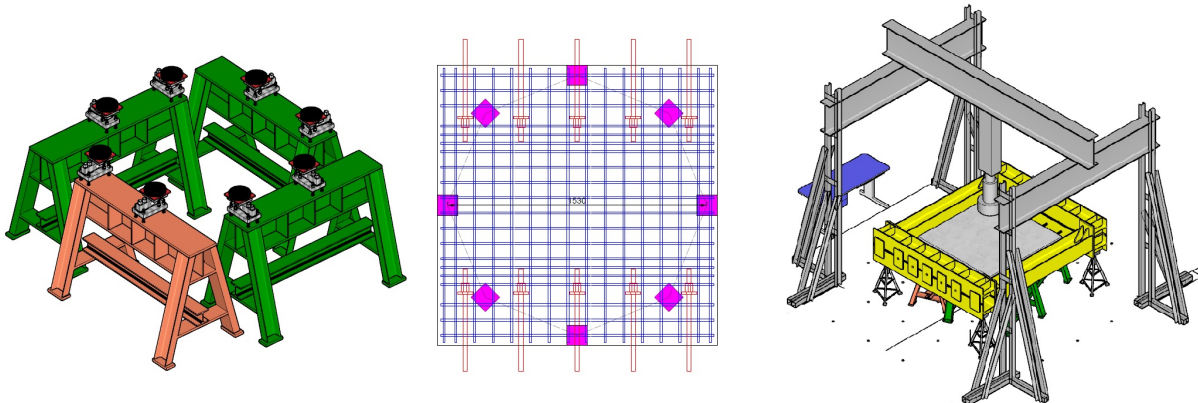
Support schema of the slabs (left and center) and final positioning of all the elements under the loading frame (right)
